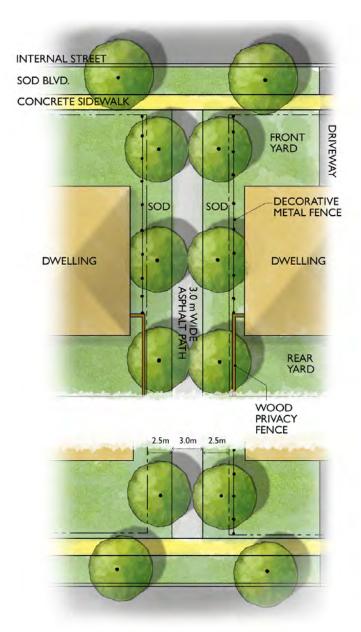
Street-to-Street 8.0m Wide Walkway Links between internal streets
